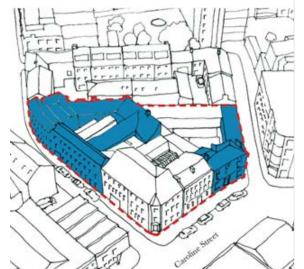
Illustrative 3D Sketch showing existing site layout with listed buildings in blue
